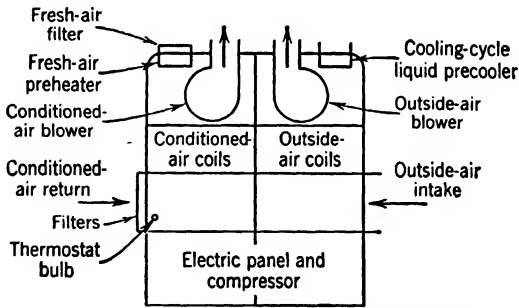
Dual-purpose heat pump adjusted for winter heating.
